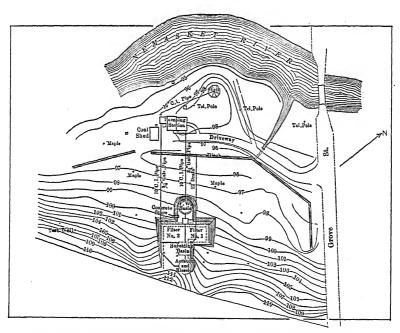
Middleboro, Mass., deferrization plant, general plan.
